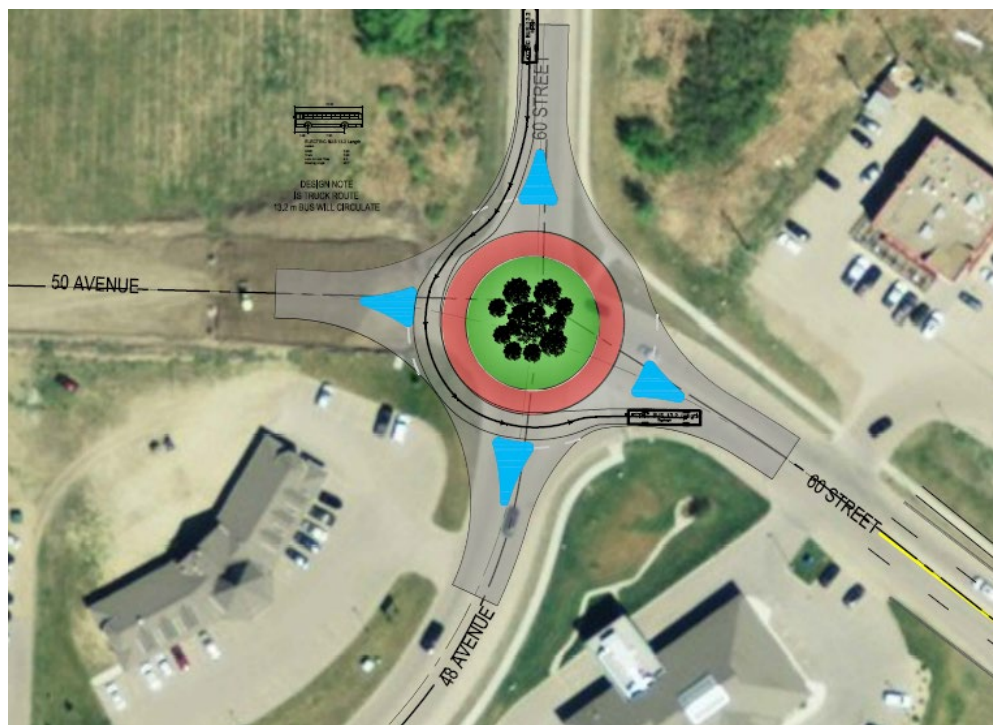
60 STREET & 48 AVENUE PROPOSED IMPROVEMENTS – ROUNDABOUT
